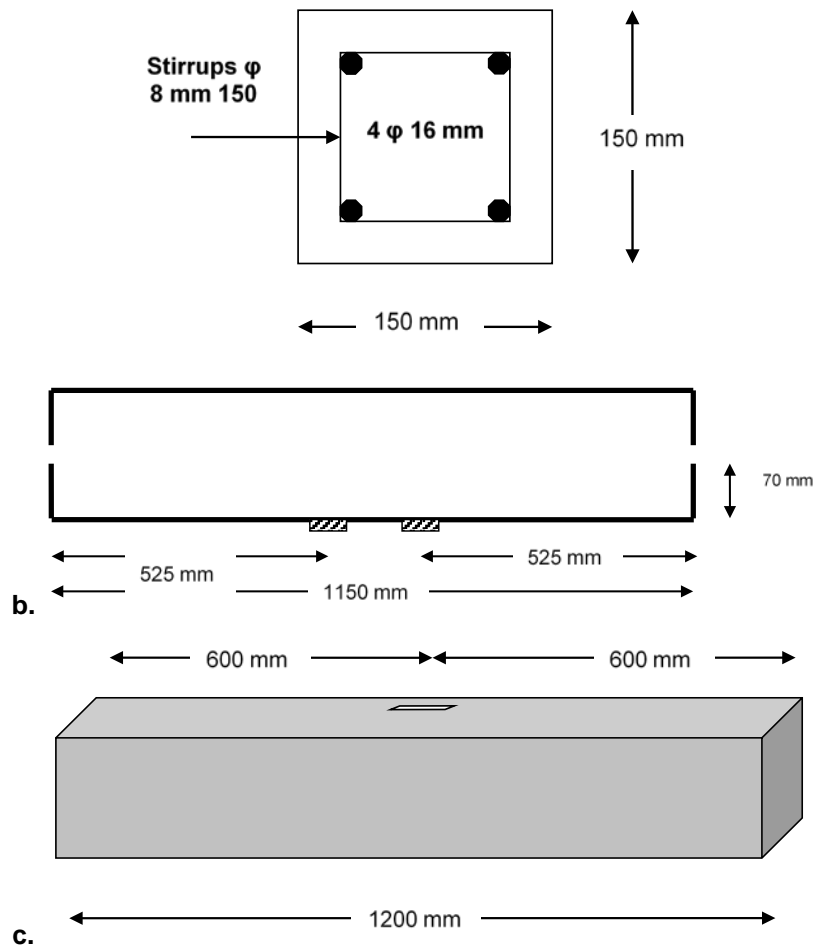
(a) RC beam cross section details, (b) Arrangement for strain gauges in reinforcement bars, (c) Arrangement of strain gauge in concrete.
